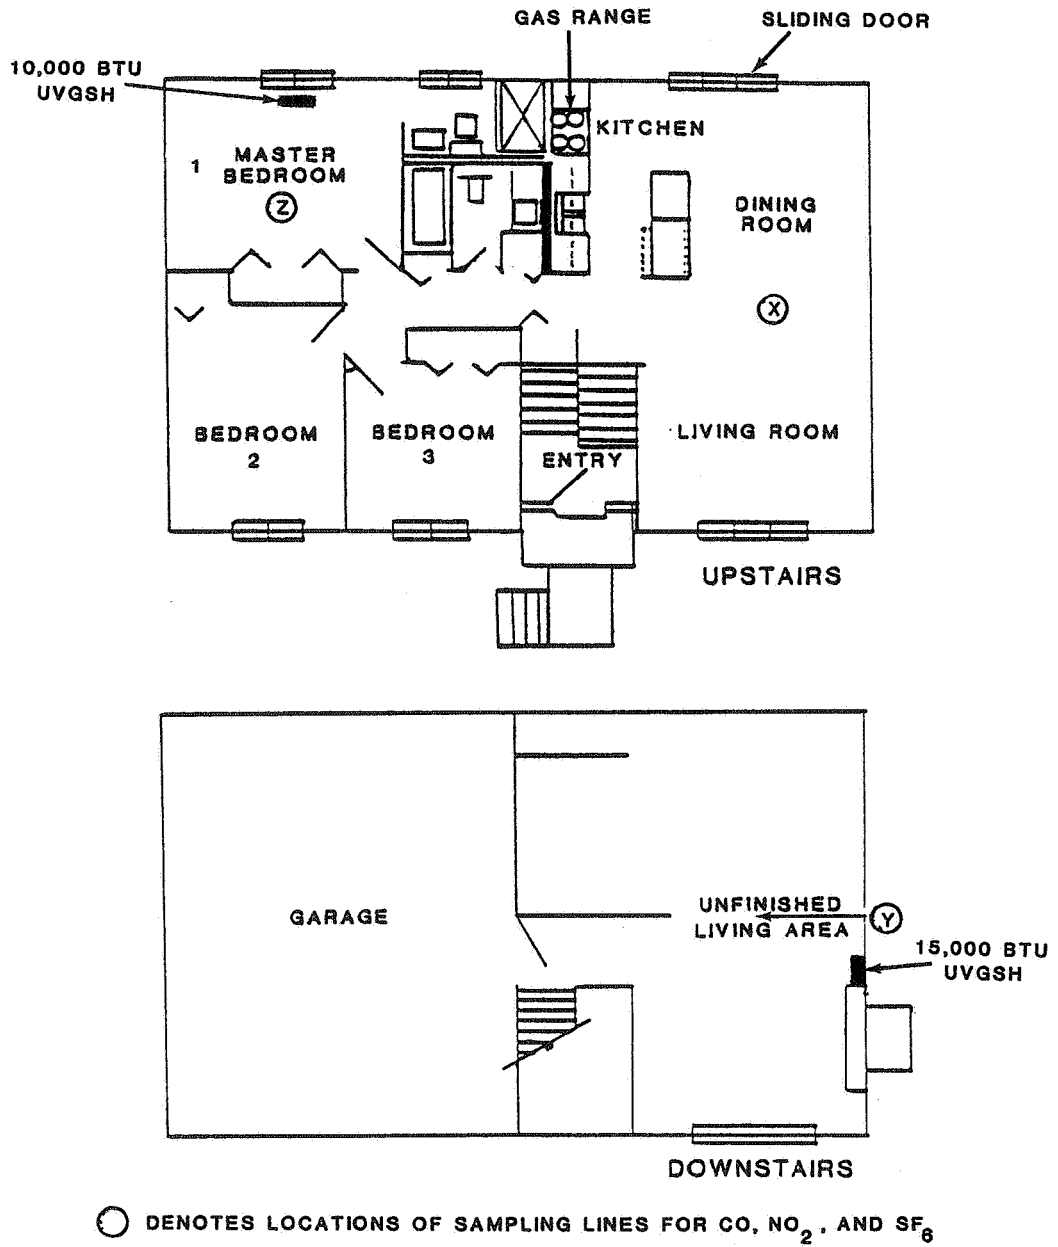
Floor Plans for the Test House Equipped with UVGSHs.
